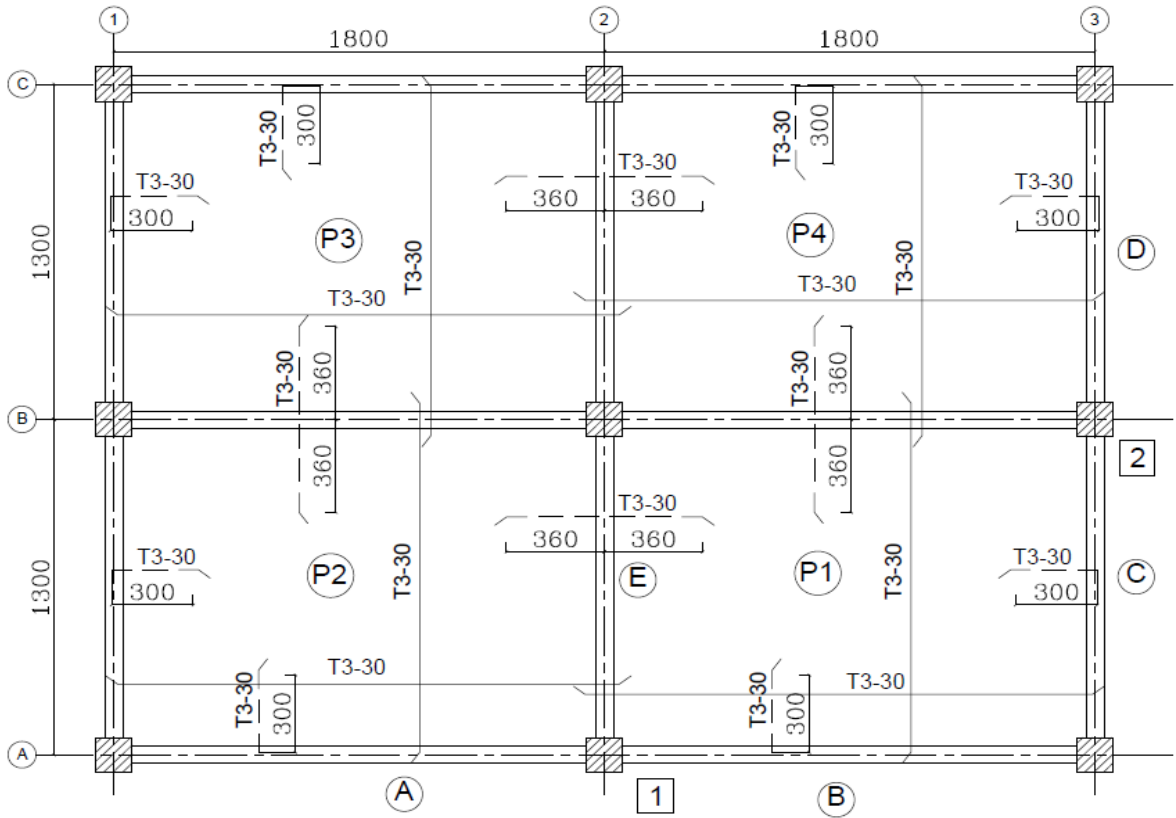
Layout of the Slab and its Reinforcement Arrangement for the 3-D Single-Story Frame [20] (All Dimensions are in mm).
